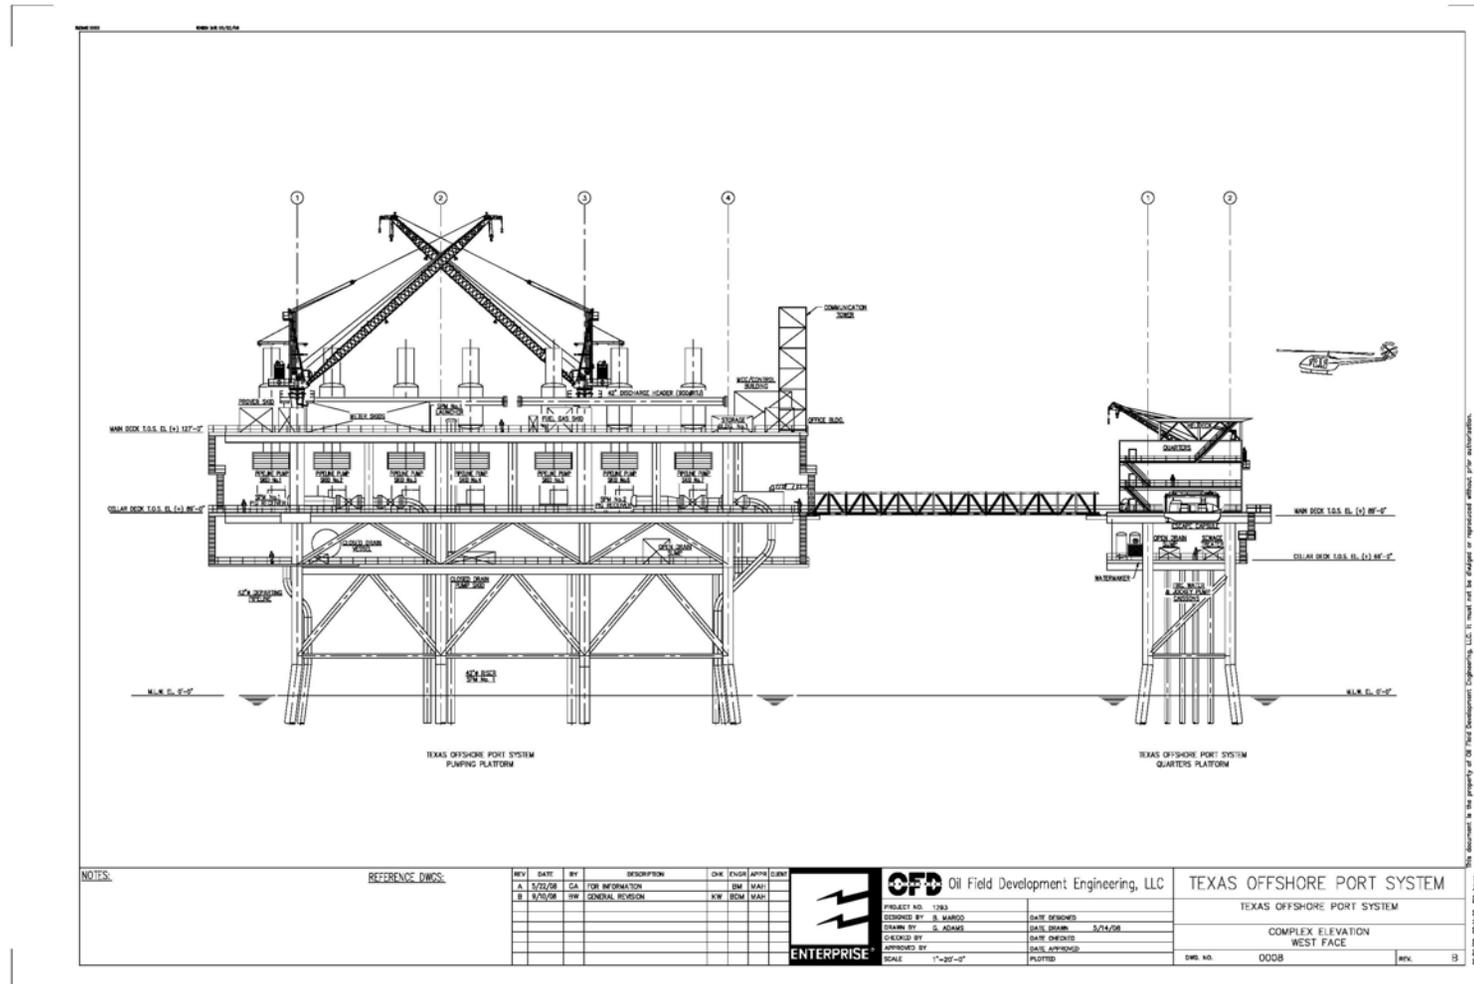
Offshore Terminal Platforms – Elevation View - West Face
